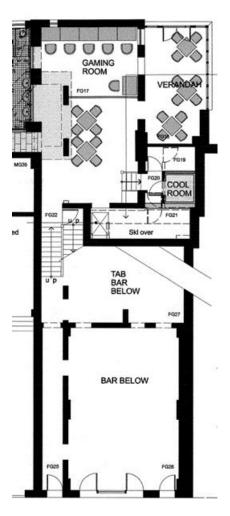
Fortune of War Hotel, 137 George Street, ground floor rear plan, showing 2010–2011 alterations Source: PMNSW, Drawing ROX-410-DA-0027-CP.
